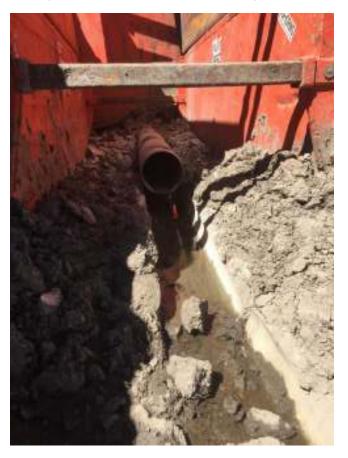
Trench sta 1+14 to 1+44, one stick of pipe remains to be removed
